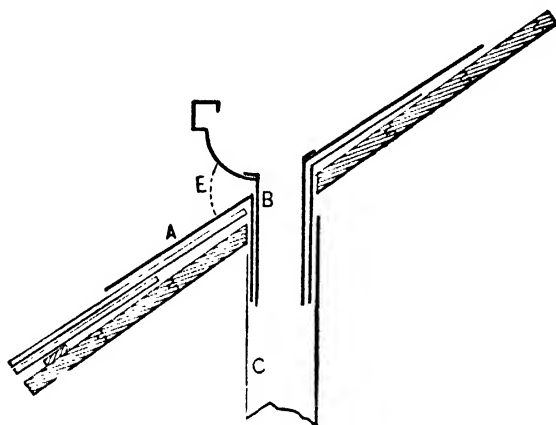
Proper Method of Water tight Joint with Sleeve, Tube and Leader
